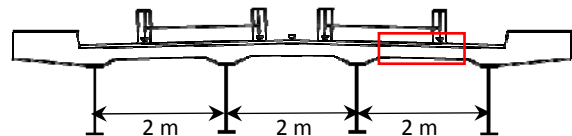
RC deck specimens cut out of the decommissioned bridge (Specimens no. 1 and no. 25 were finally employed.)
